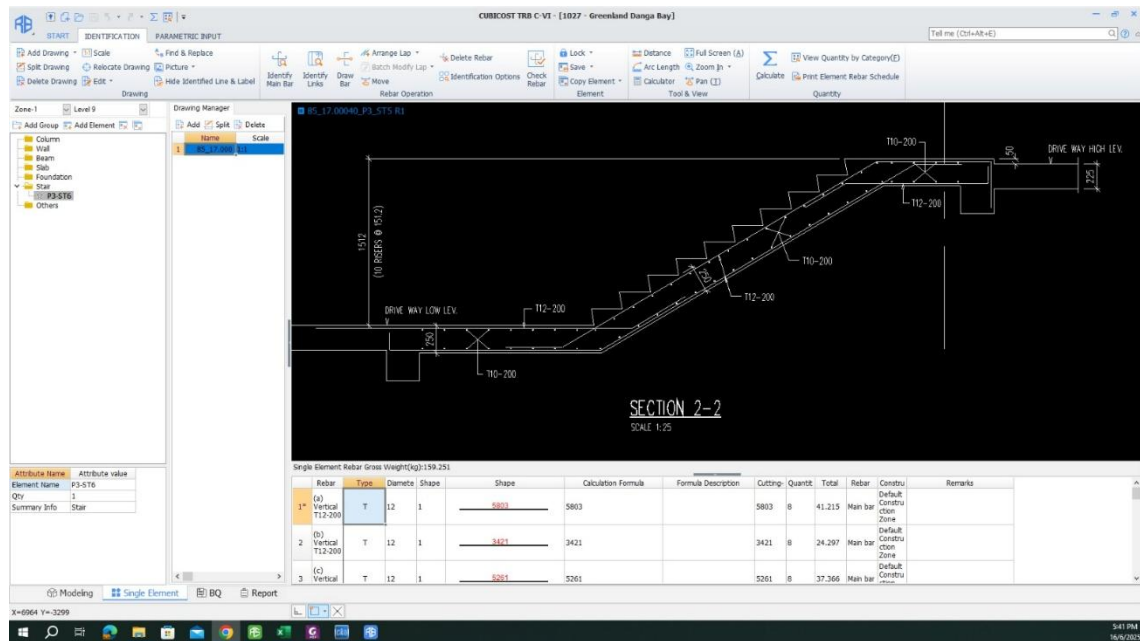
61 Johor Apartment Greenland Danga Bay Stair Rebar Measurement
